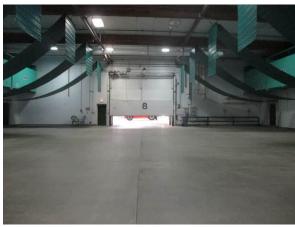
Interior view of refrigerated room within the northern portion of the warehouse area.
